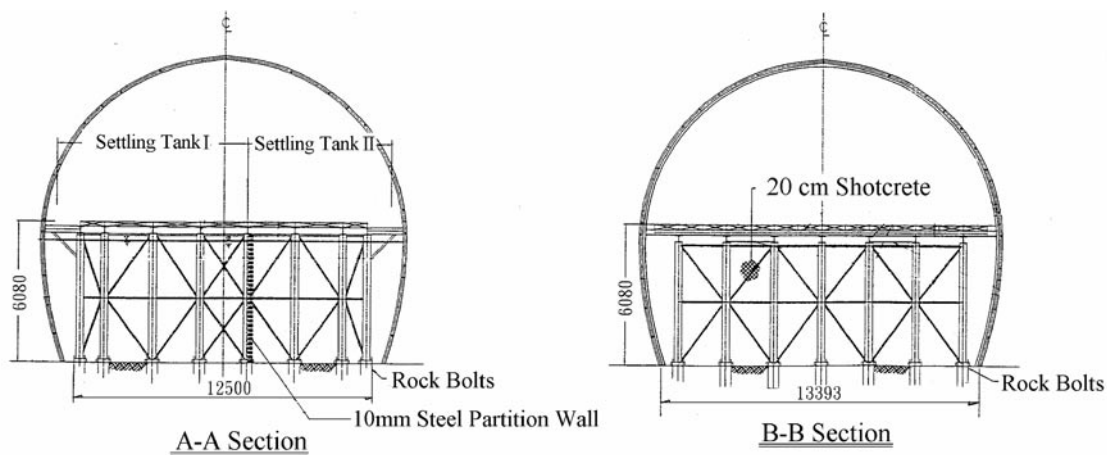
The Cross-Section of Deck Platform in the Exhaust Air Ventilation Cavern
